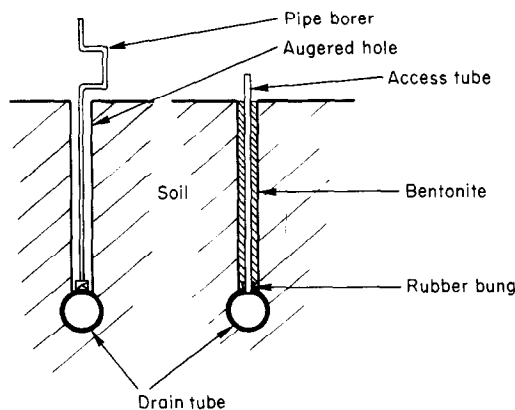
Placement of an access tube into a tile drain using the technique described by Cavelaars⁴ for the installation of piezometers
